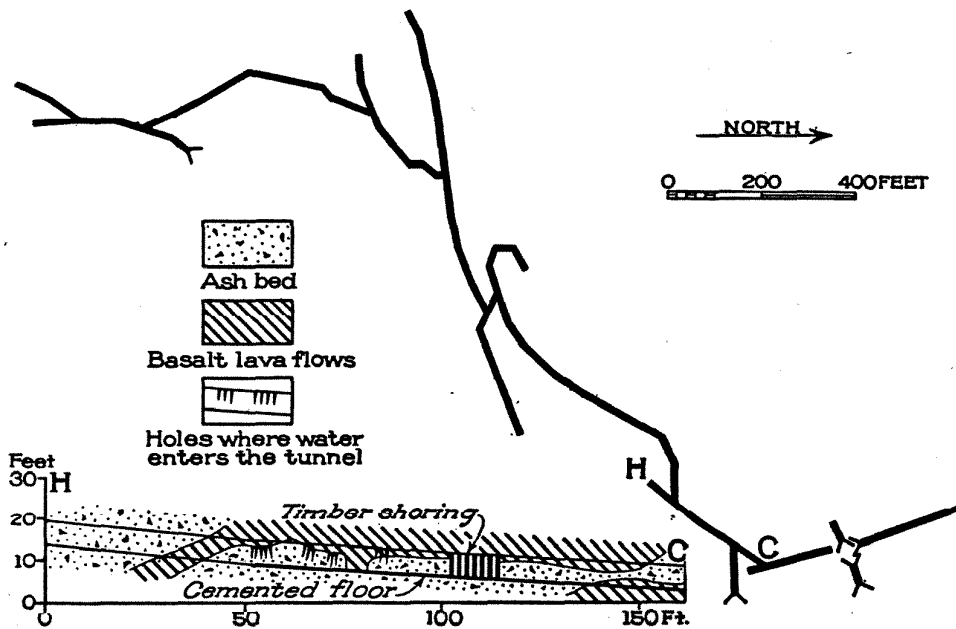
Plan and section CH of Mudflow Tunnel (no. 80) in the Kau District.
